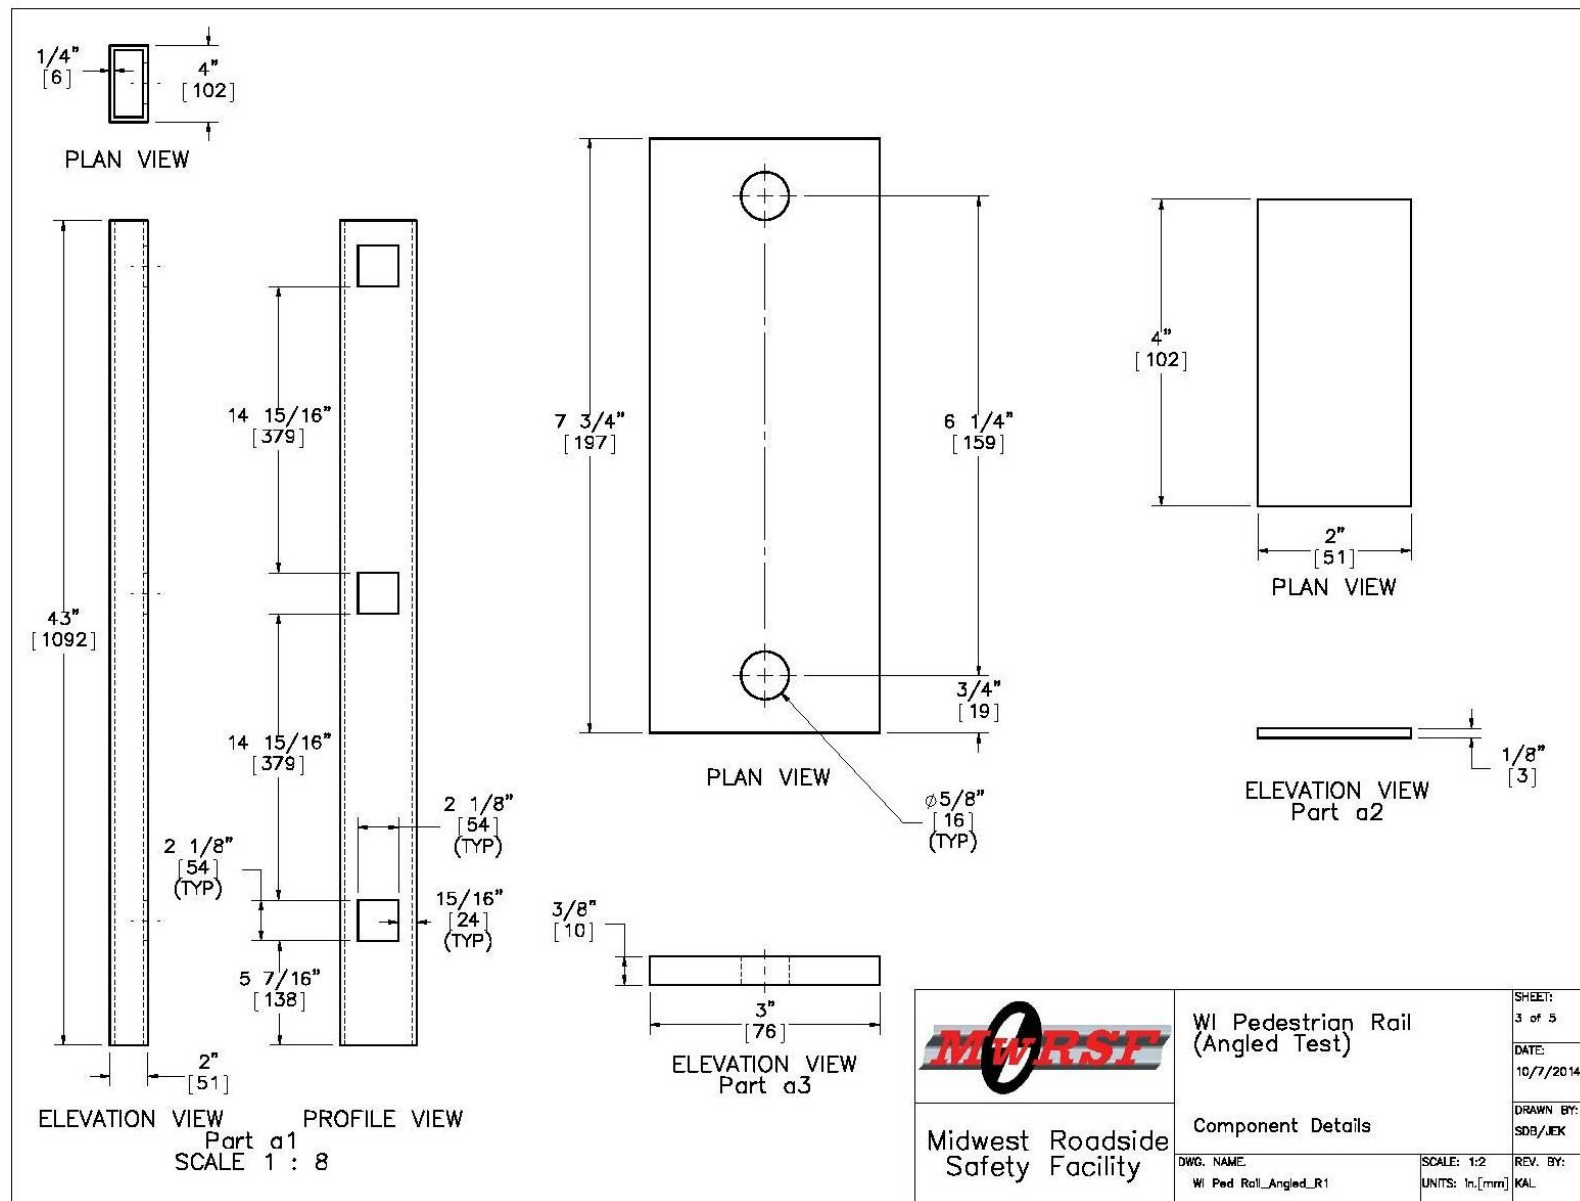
Component Details, Test Nos. APR-1 and APR-2
